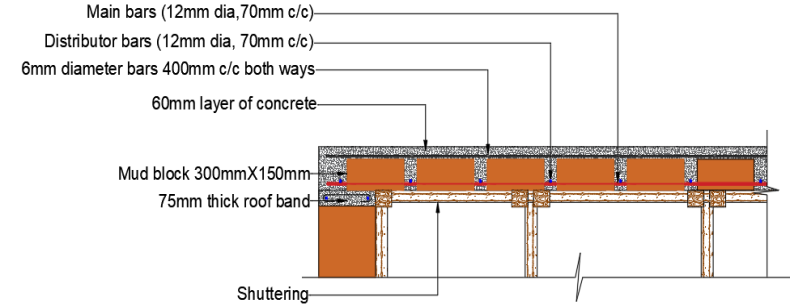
RCC Slab reinforcement details
